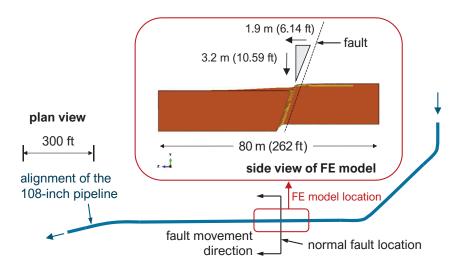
Plan view of the normal fault crossing configuration (108-inch pipeline). (Source U. of Thessaly, 2025)
